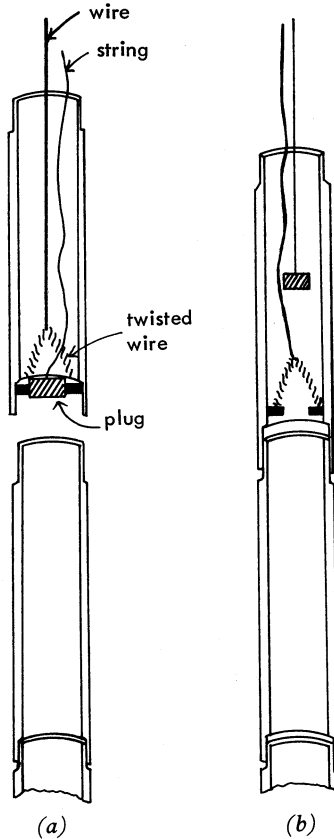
A method for lowering clay pipes into a tube well: (a) lower pipe; (b) release plug by pulling string and withdraw carefully.
